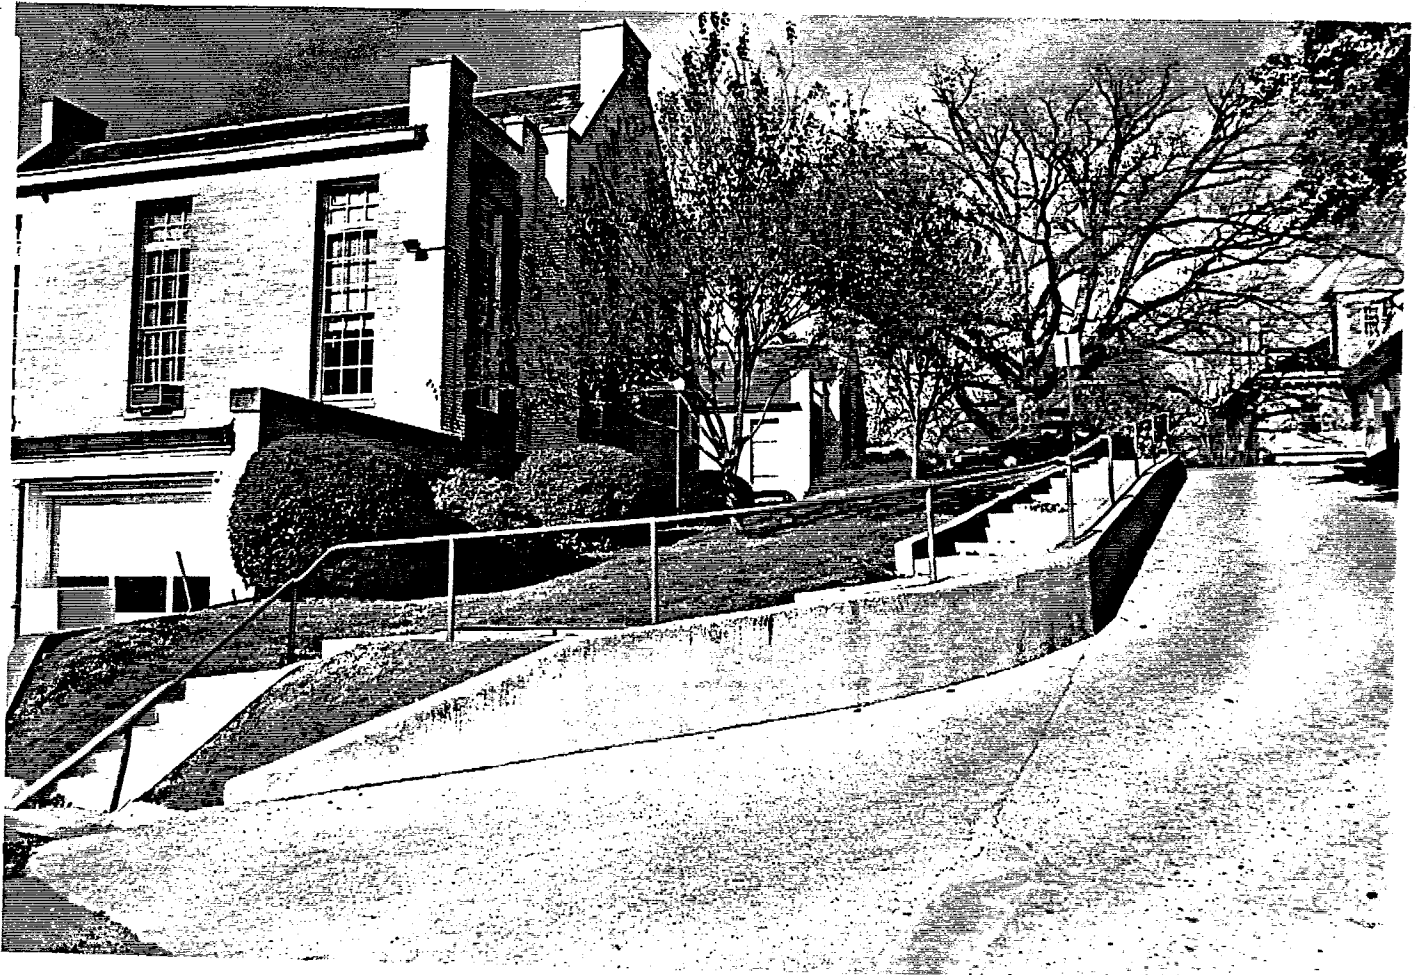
Figure GG: Site and Landscape, view of driveway at south -eastern pavilion.
